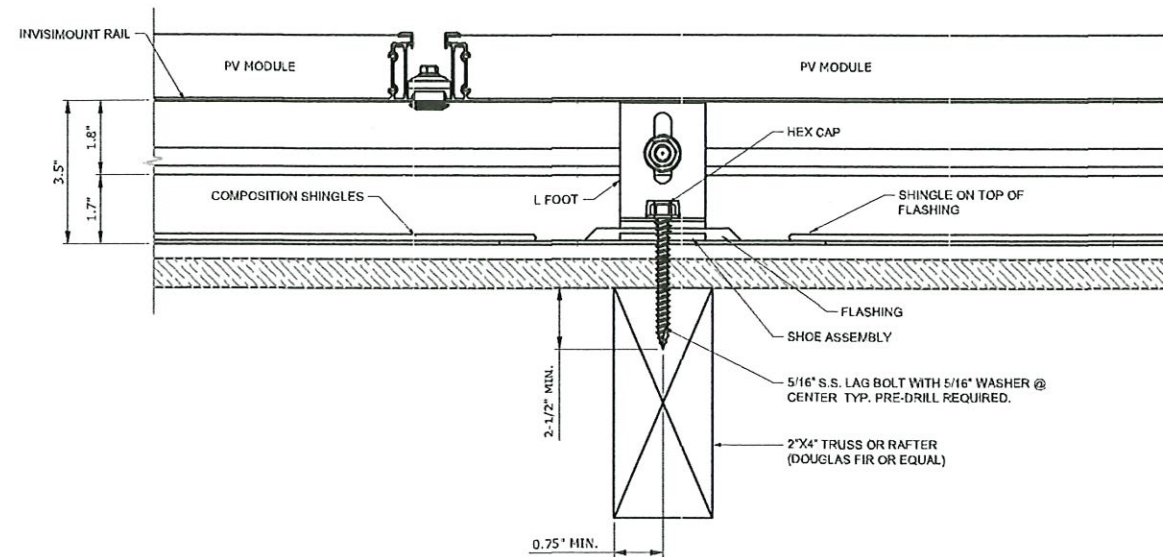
ROOF 3 STRUCTURAL FRAMING DETAIL
